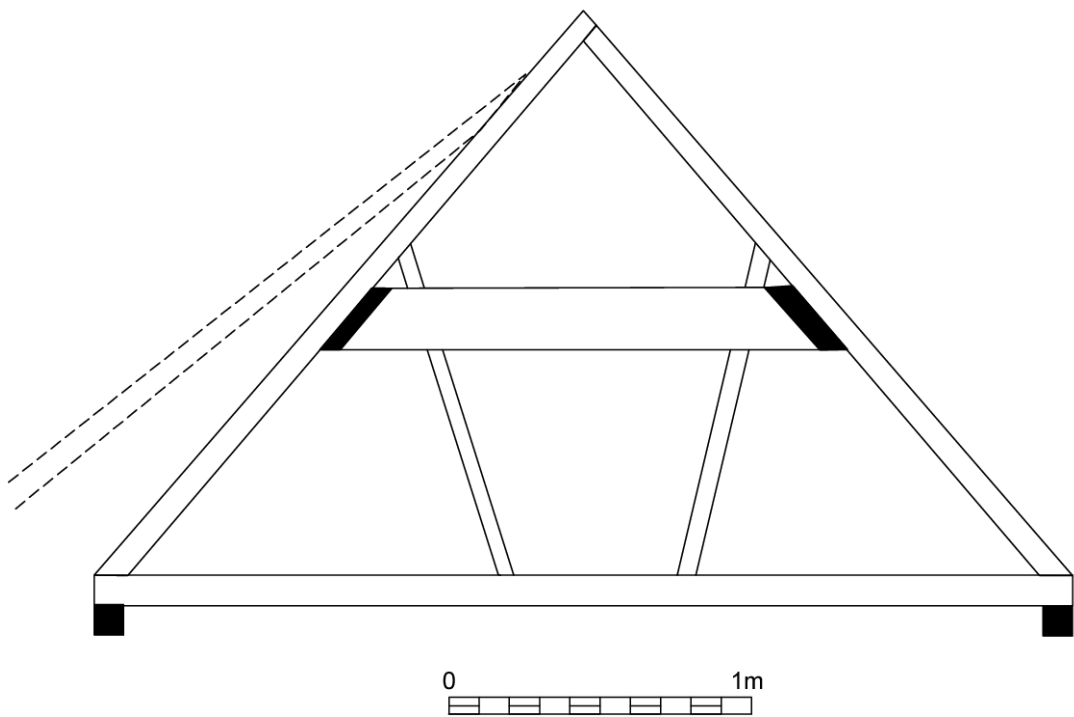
Schematic drawing of a roof truss looking north (*scale 1:25*)
